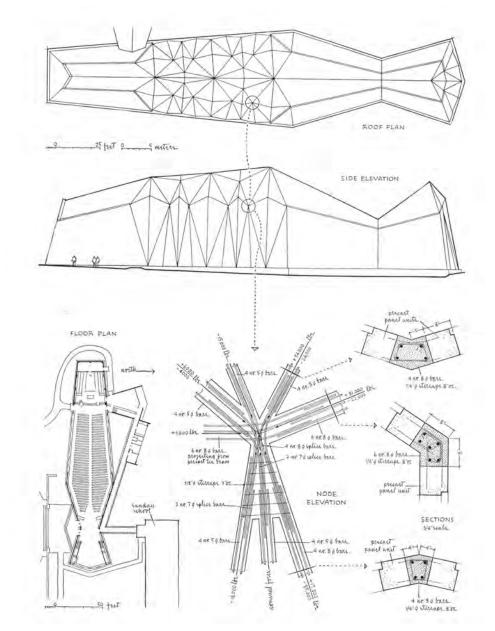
Details of cast-in-place concrete rib construction. "Precast-Concrete Facets Enclose Piscine-Form Sanctuary," p/a news survey, April 1958, 107. These details are also found on the original drawings.
